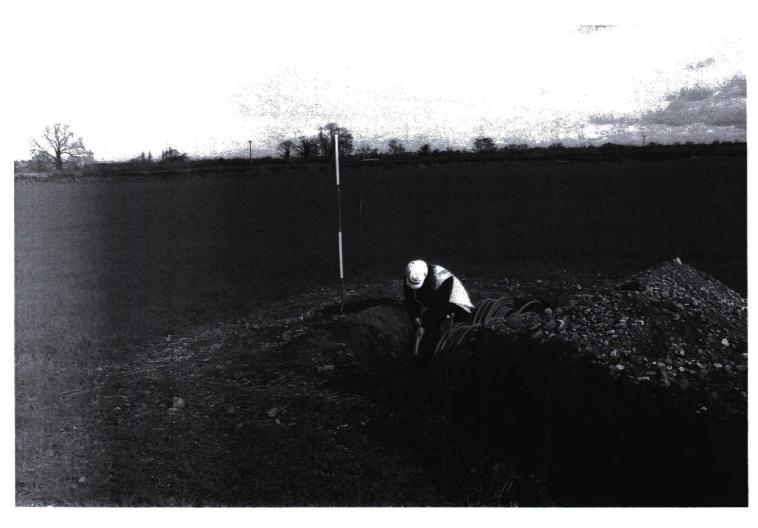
Placing of aluminium marker at junction of Trench 1 and previous excavated pipe trench. Facing north.
